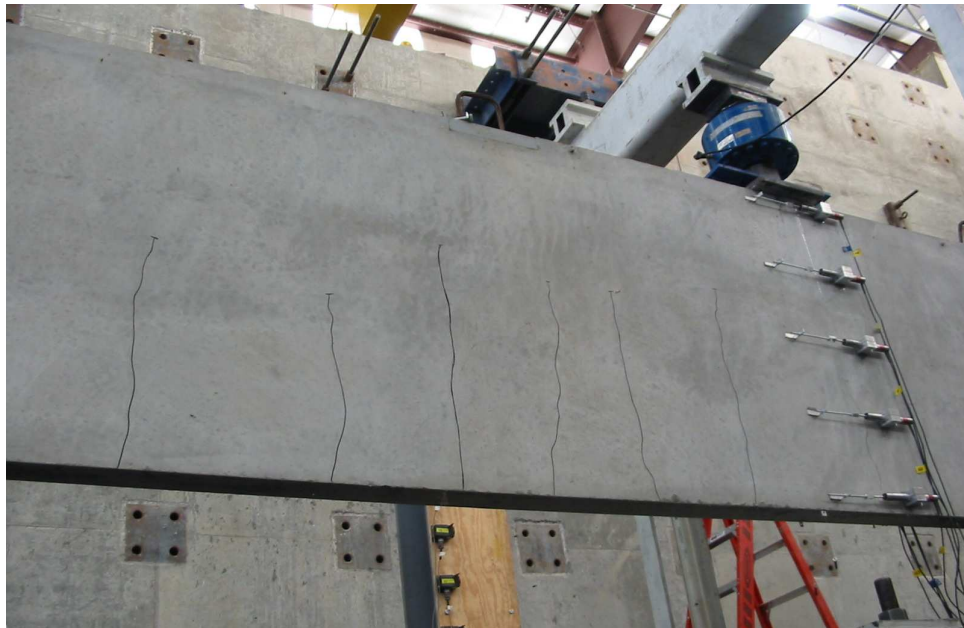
Photo flexural cracking before buckling of Beam C2B
